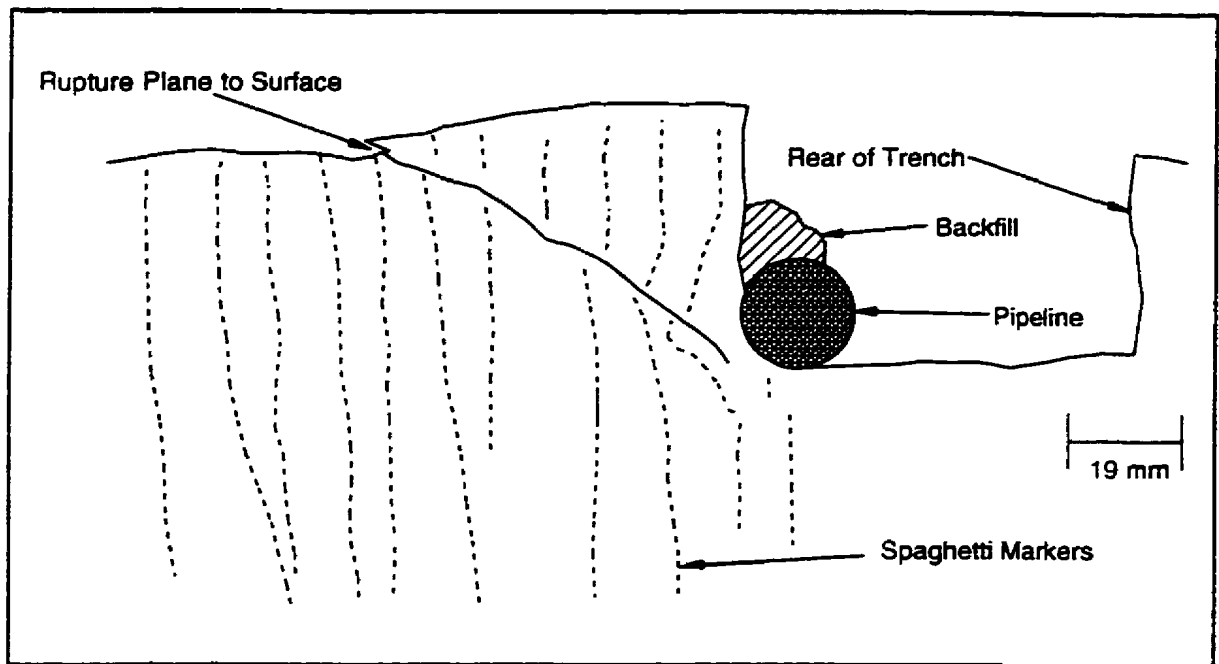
Sketch of excavated cross-section along mid length of model pipeline #3, remoulded backfill, Test 09.
